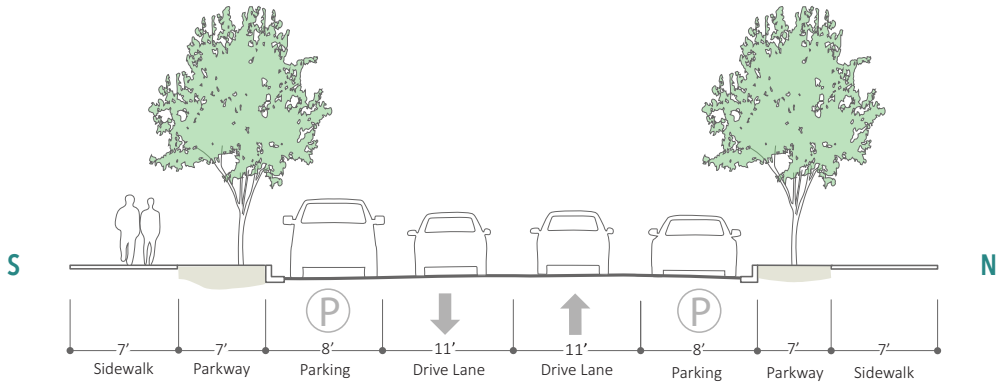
SECTION J - NEW RESIDENTIAL STREET
